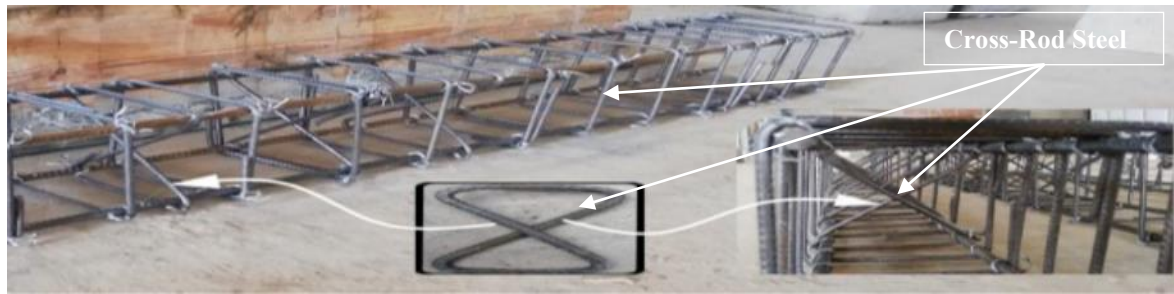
Internal Cross-Rod Steel Reinforcement Details.[8]
